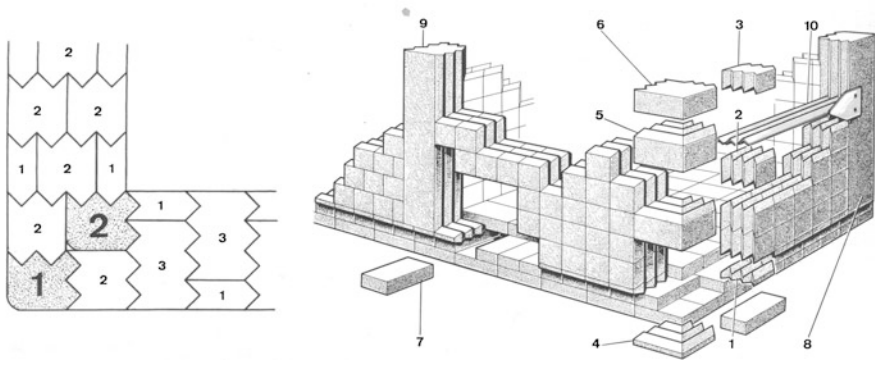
Example of constructing a lead wall with interlocking lead bricks [3]
